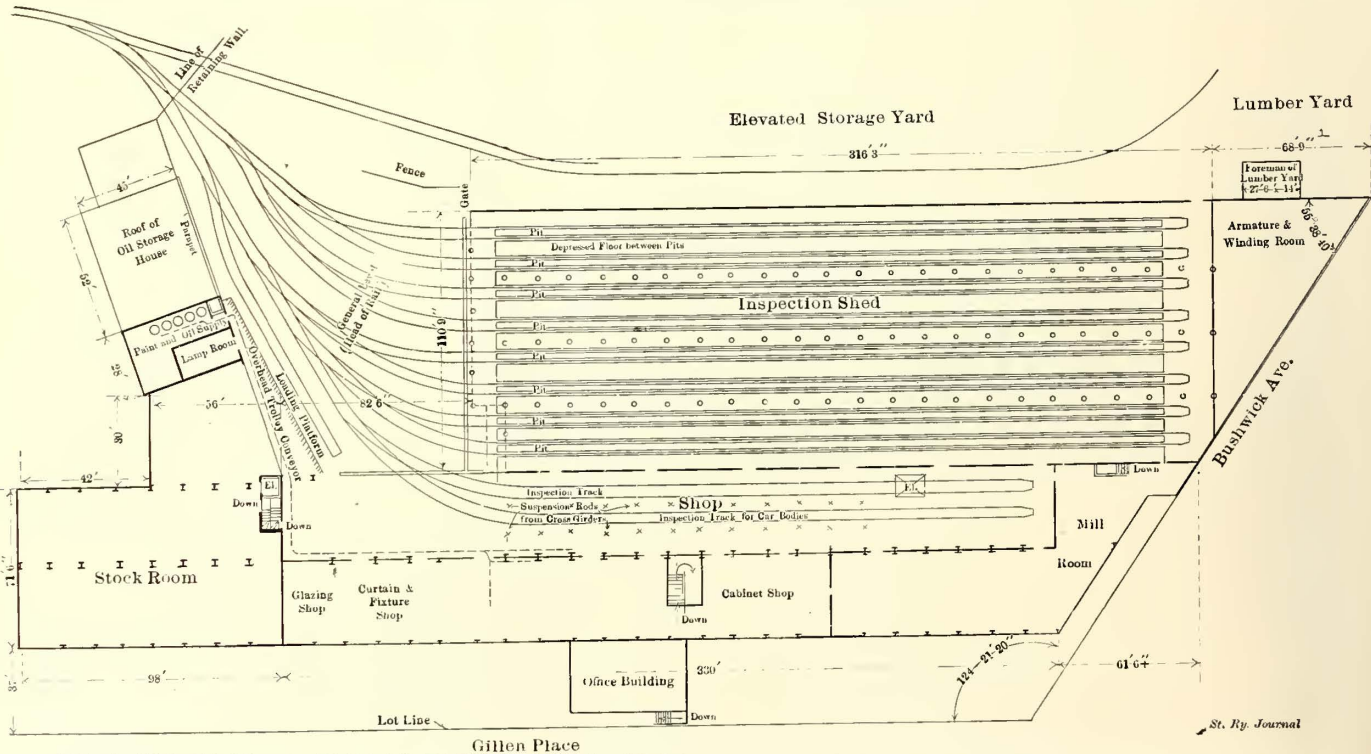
SECOND-FLOOR PLAN OF THE EAST NEW YORK SHOP AND STORAGE BUILDINGS, AND OF THE ELEVATED RAILWAY TRACKS
